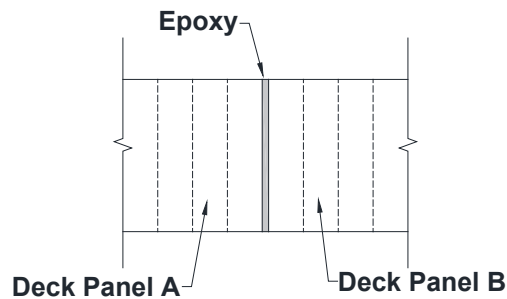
Recommended Deck-to-Deck Connections for Glulam Girder Bridges
